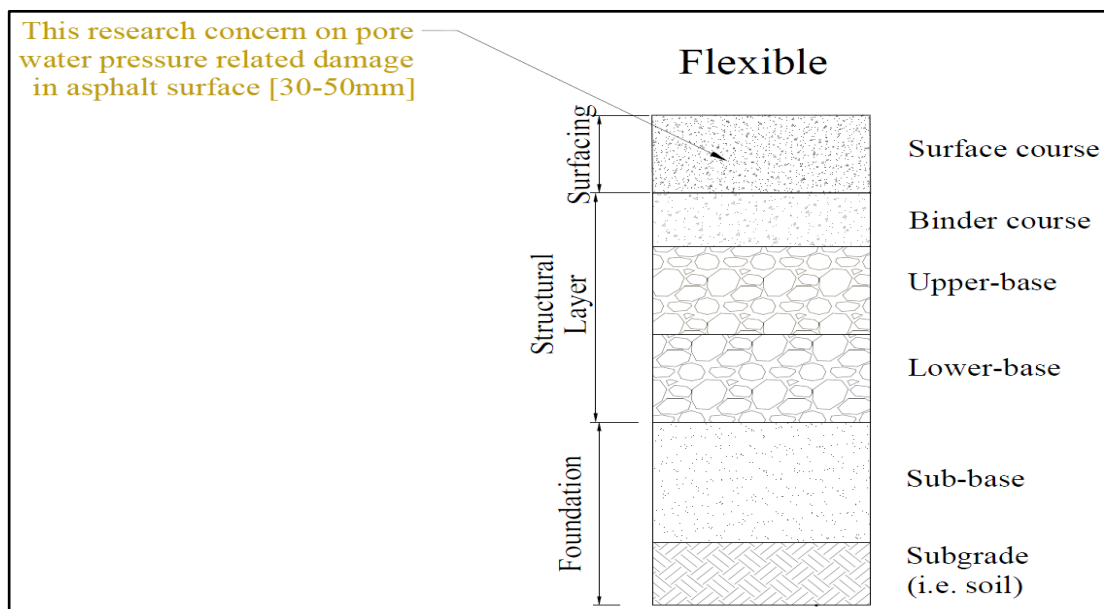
Typical pavement type using in highways (adopted from Tom, 2008)
